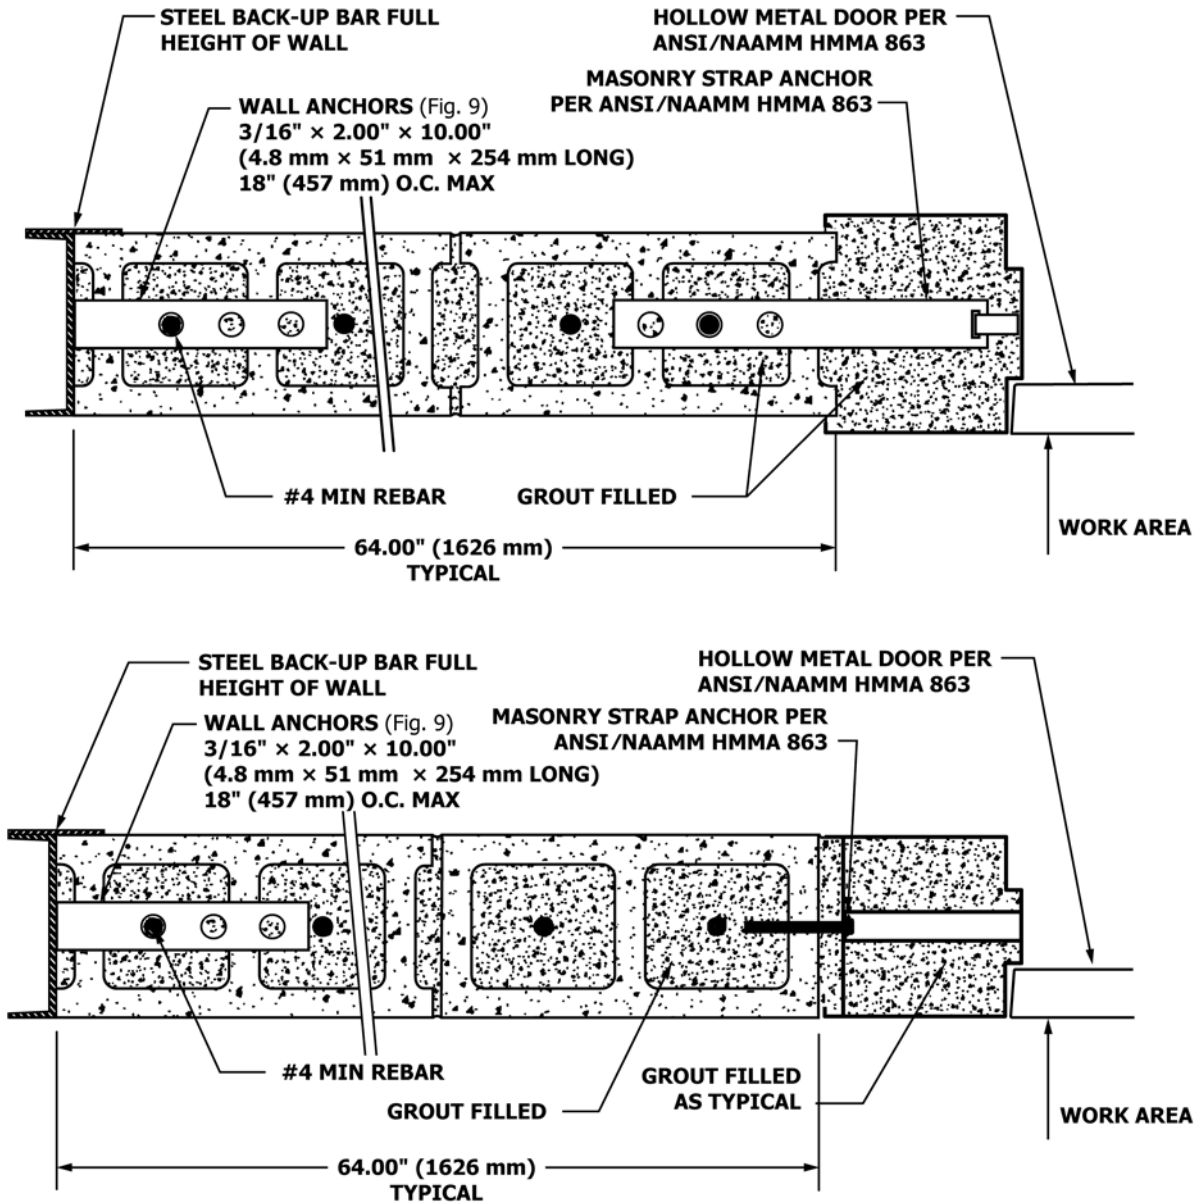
Section C-C HMMA 863 Type Masonry/Concrete Anchors
